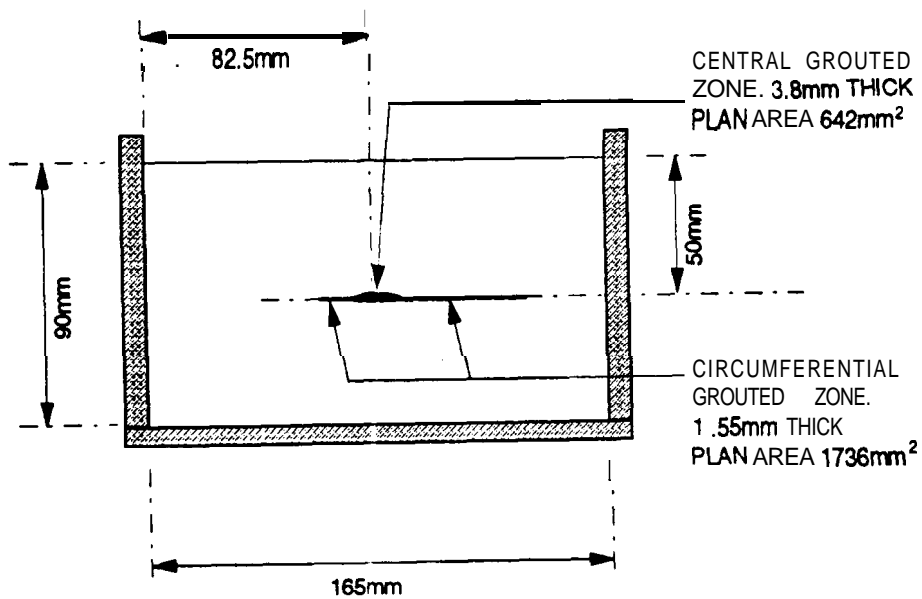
Cross-section of soil model with fracture details from Test CYC 10
